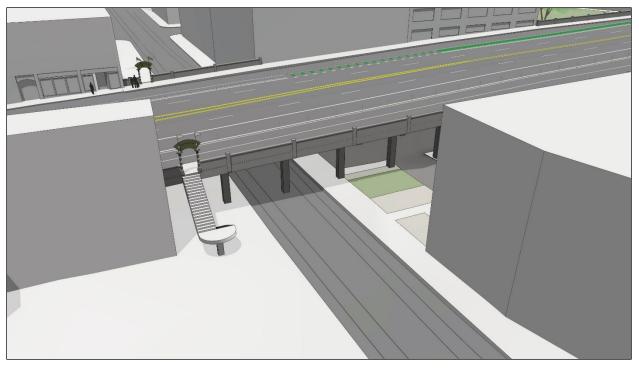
Reed Building, artist's rendering of existing condition of west approach, aerial view looking northeast (Fat Pencil Studio, 2021).
